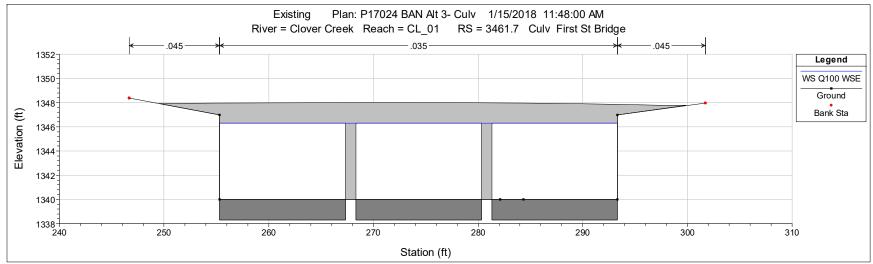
Upstream Face of Proposed Culvert, Looking Downstream (South)
